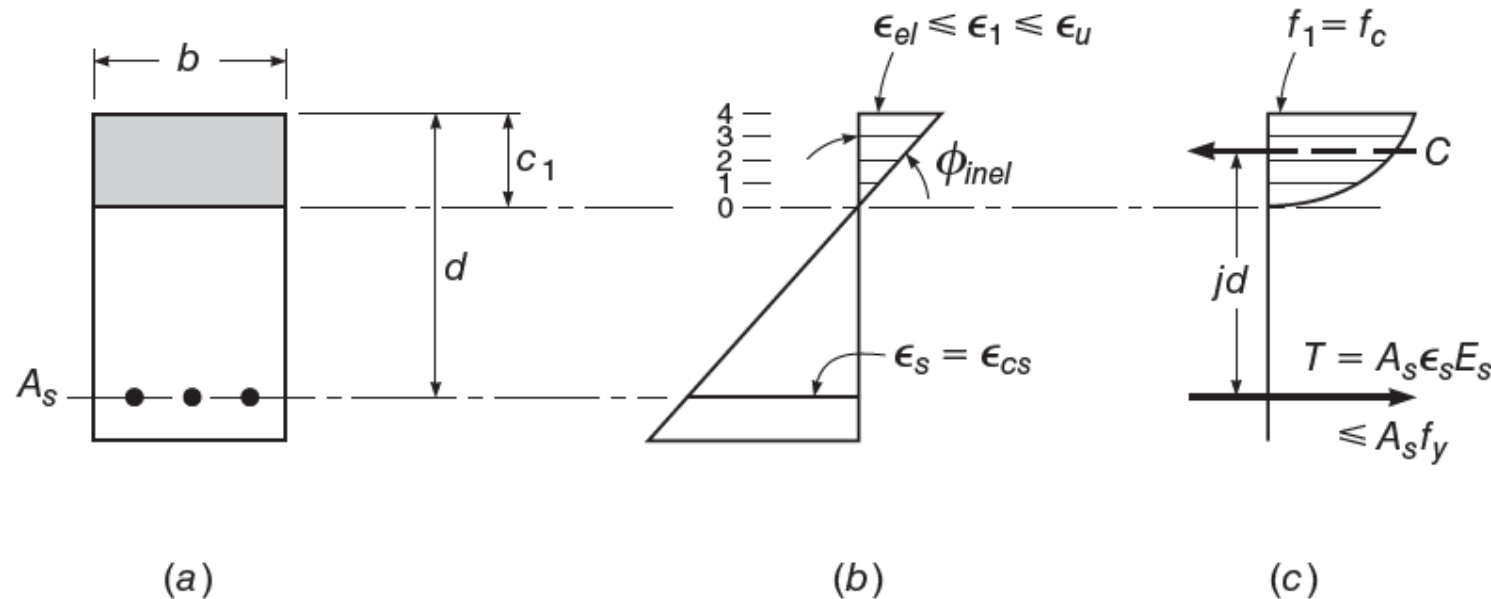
Cracked beam with concrete in the inelastic range of loading: (a) cross section; (b) strains; and (c) stresses and forces.
